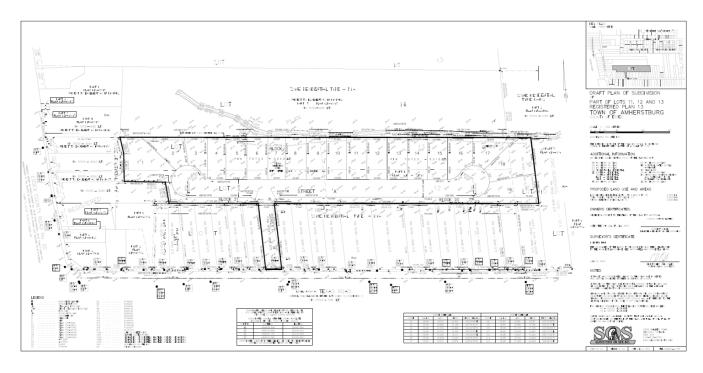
Draft Plan of Subdivision for Brittany's Gate Subdivision
